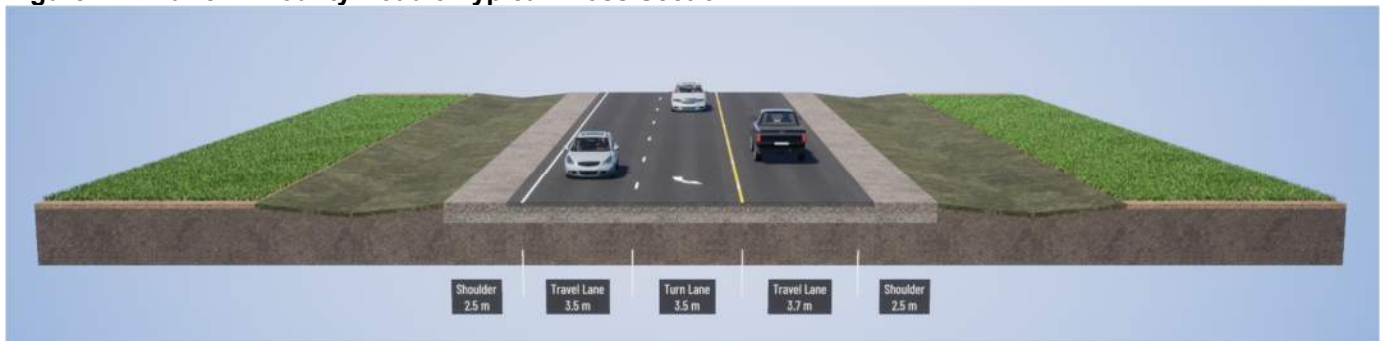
Re-aligned 2nd Line Amaranth Typical Cross Section
